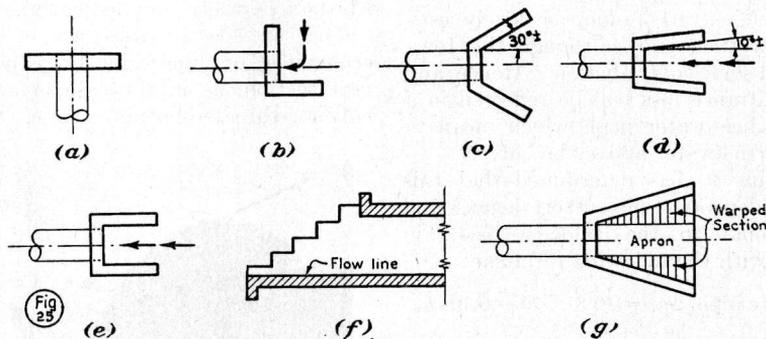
Types of Endwalls and Headwalls. (a) Straight Headwall or Endwall, (b) L-headwall (c) Wing Headwalls or Wing Endwall (30 deg. \pm flare), (d) Flared Headwall (10 deg. \pm flare), (e) U-type Headwall or Endwall, (f) Stepped U-type Headwall or Endwall, (g) Warped Wingwall or Endwall.
